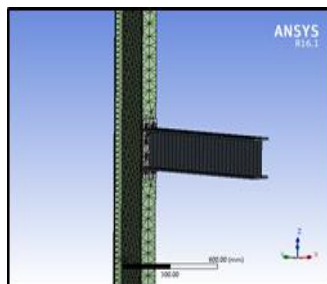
ANSYS mesh model of beam column joint with wing plate stiffeners at bottom
